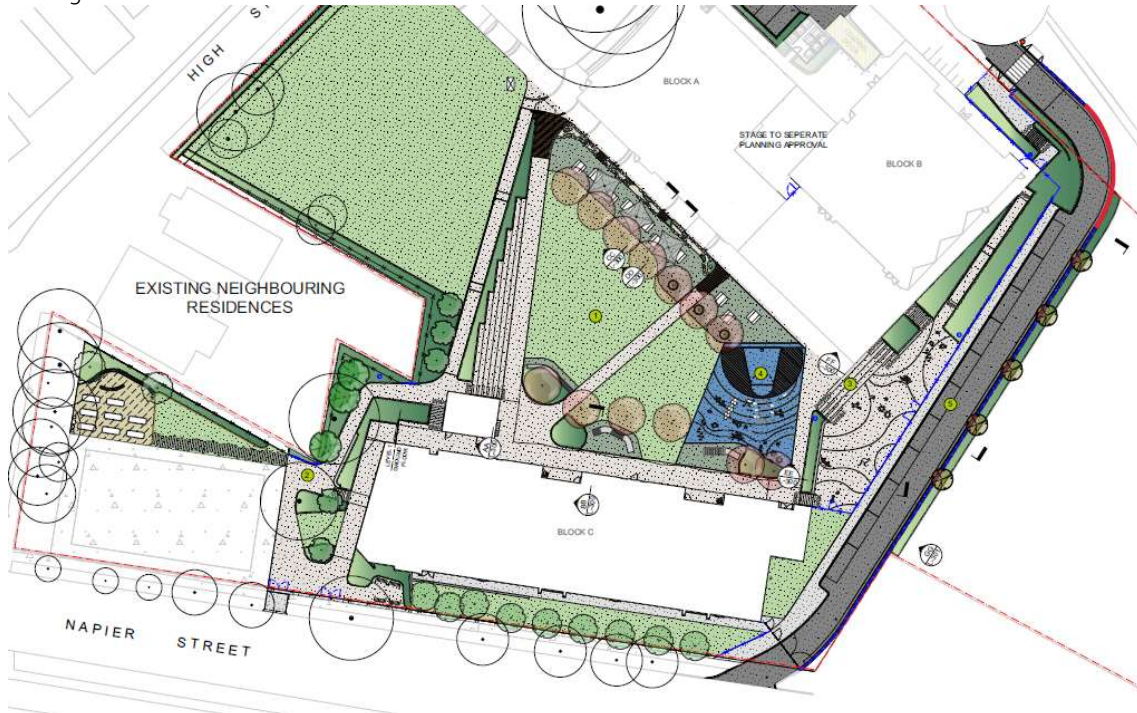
Landscape plan showing solid reinforced blockwork retaining wall and vehicle barrier balustrading
